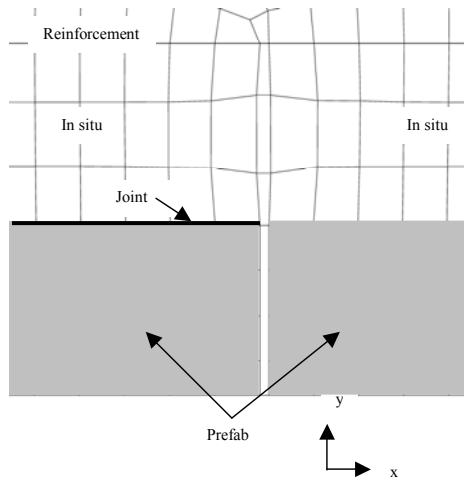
Detail of the modelling of the prefabricated and in situ cast concrete and the cast joint
